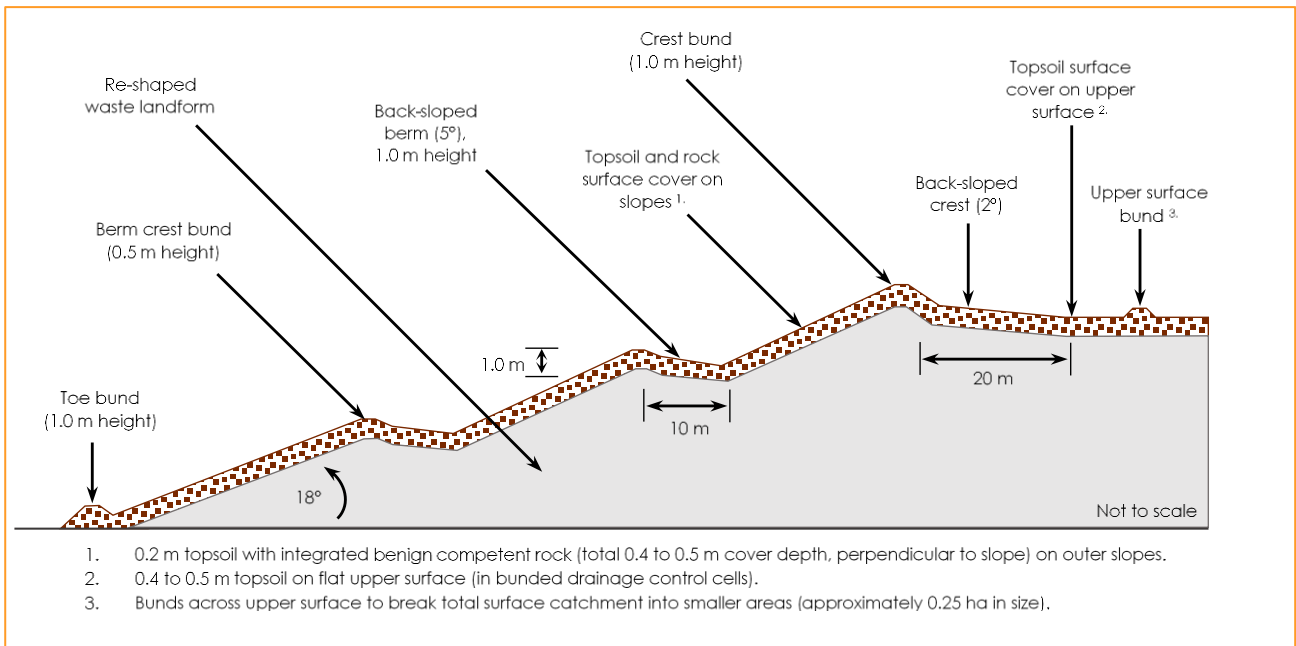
Cross section diagram of conceptual re-shaped design for the Mt Weld WRL (not to scale) (Stantec 2017d)
